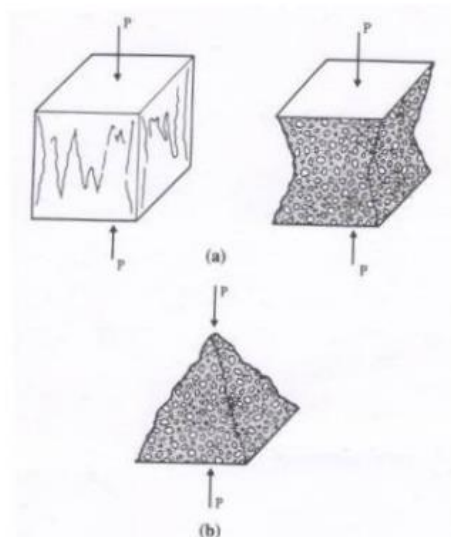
4 Various Failure Modes of a Concrete Cube & Cylindrical Specimen under the Compression Loading Test
